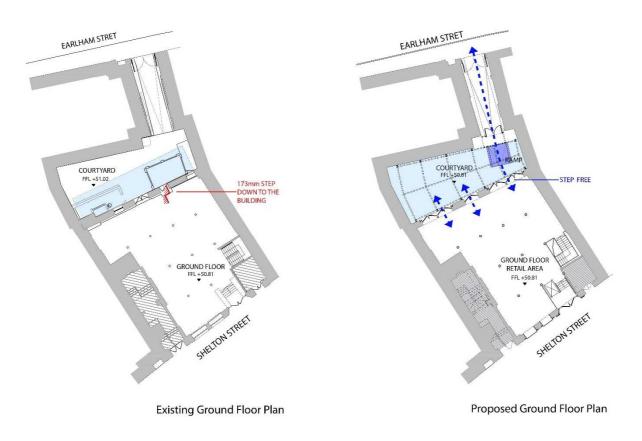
Ground Floor Plan: Access Free for Wheelchair Users
